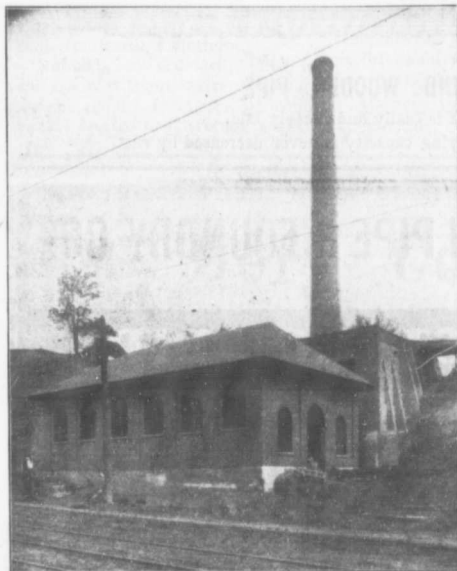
VIEW OF WESTMOUNT DESTROYER AND ELECTRIC LIGHT PLANT.
